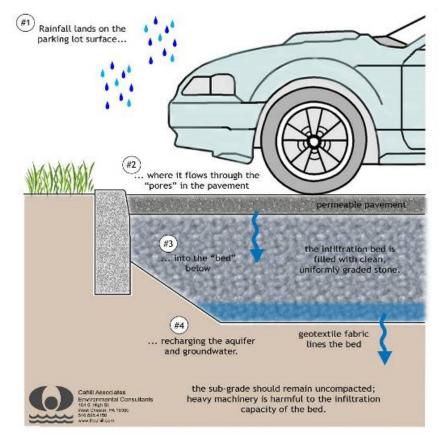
Cross-section showing design components of a permeable pavement with subsurface infiltration bed. Where infiltration is infeasible, underdrains can be fitted into the subsurface bed. Source: Cahill Associates
